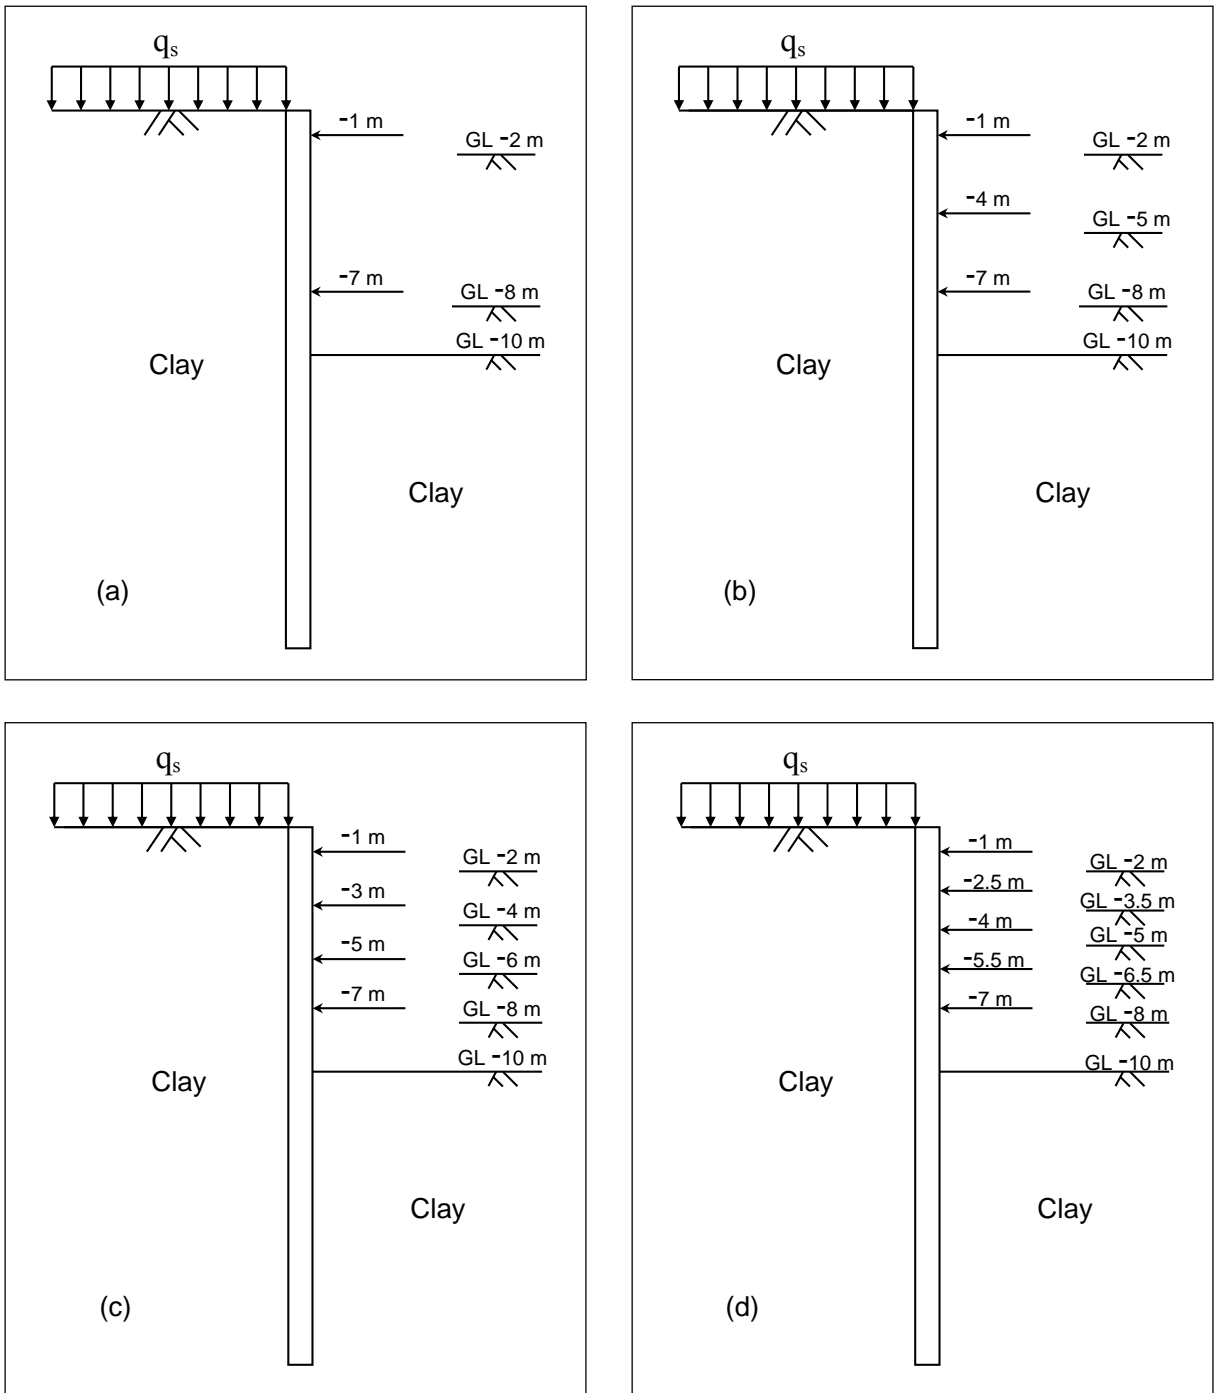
Four different strut layouts for design of braced excavations: (a) 6 m spacing; (b) 3 m spacing; (c) 2 m spacing; (d) 1.5 m spacing
